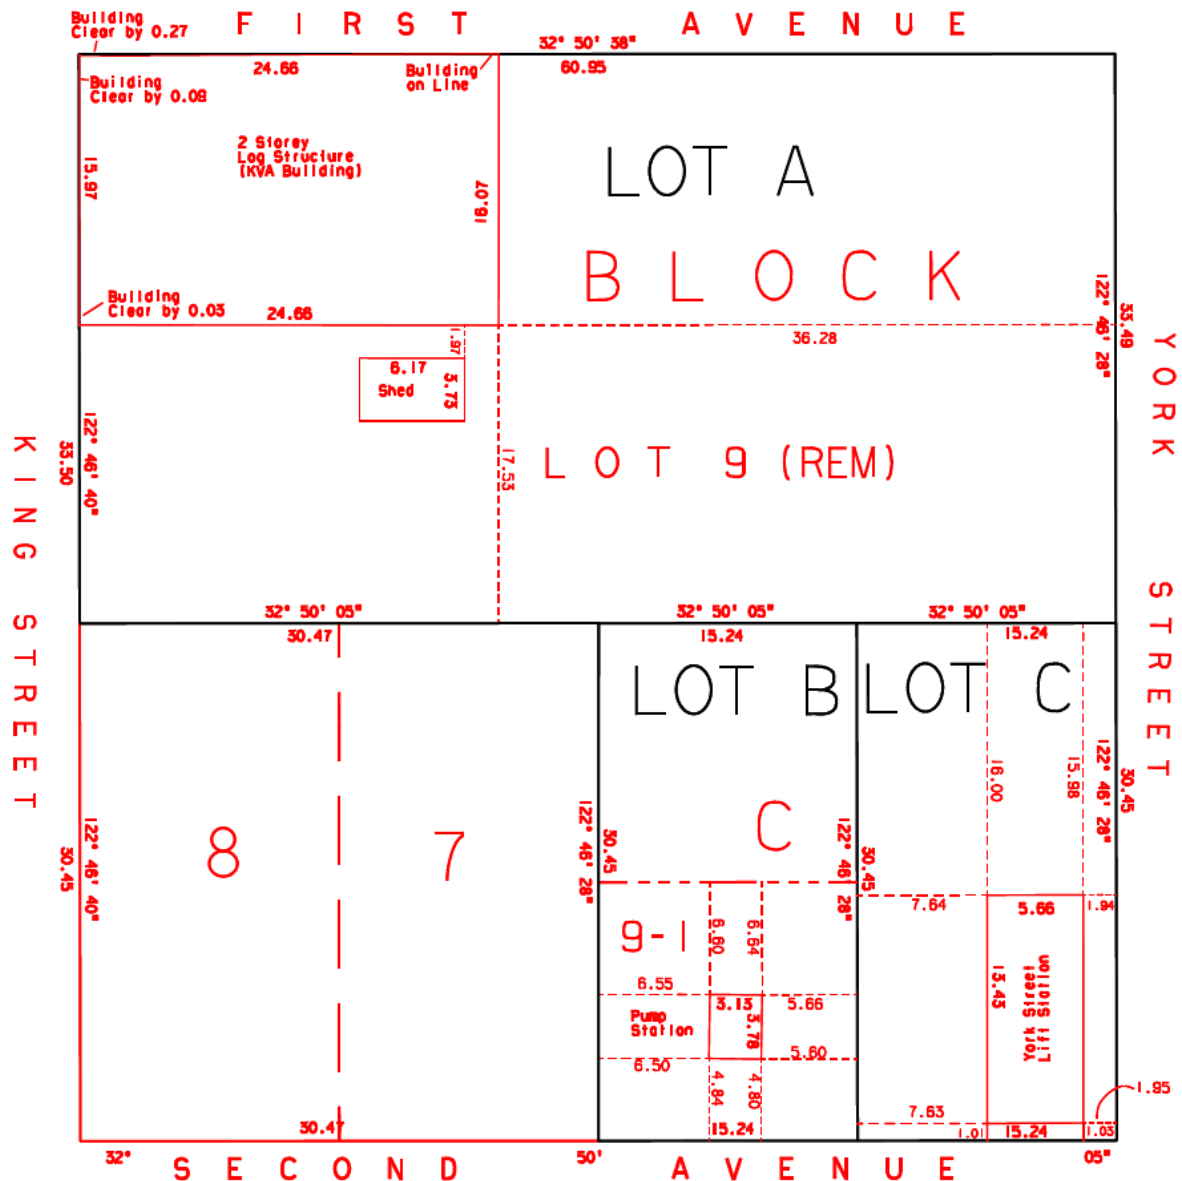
Proposed lot configuration, including existing buildings. Note: 9-1 Pump Station since demolished.
